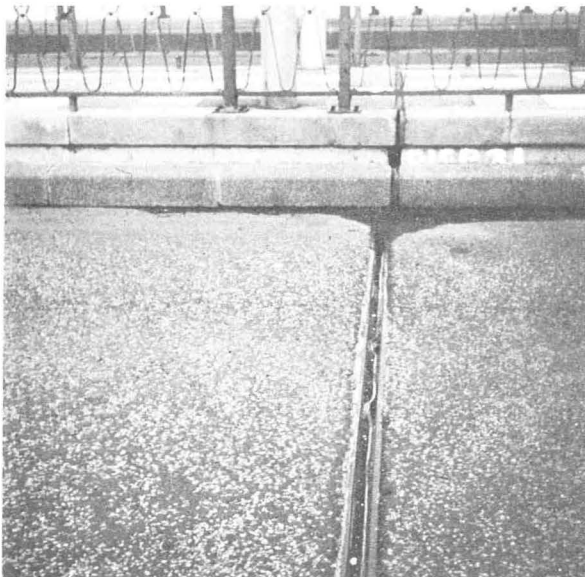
B. Tay Bridge-Typical distress at intermediate joints.
